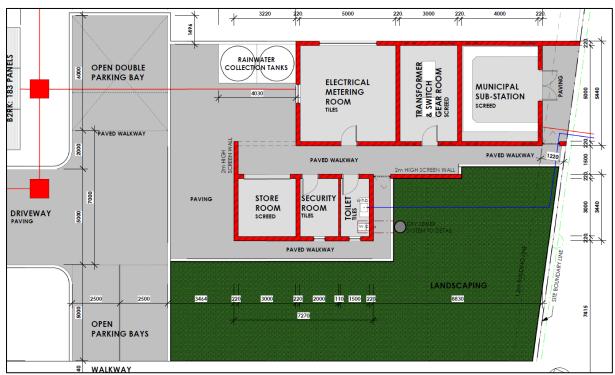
Detailed layout of the proposed buildings, substation etc.
